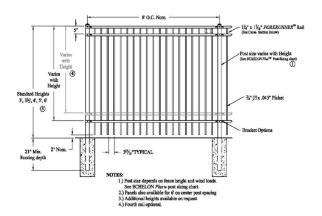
Townhomes Fence Details See Section 5.5 for Details
